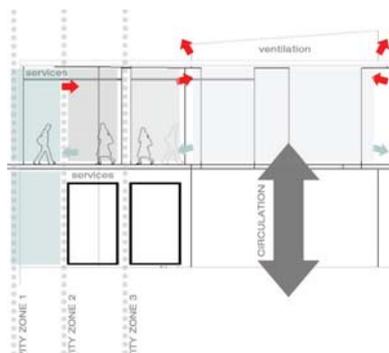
Concept exploration in terms of building envelope and activities (Athor2011).
